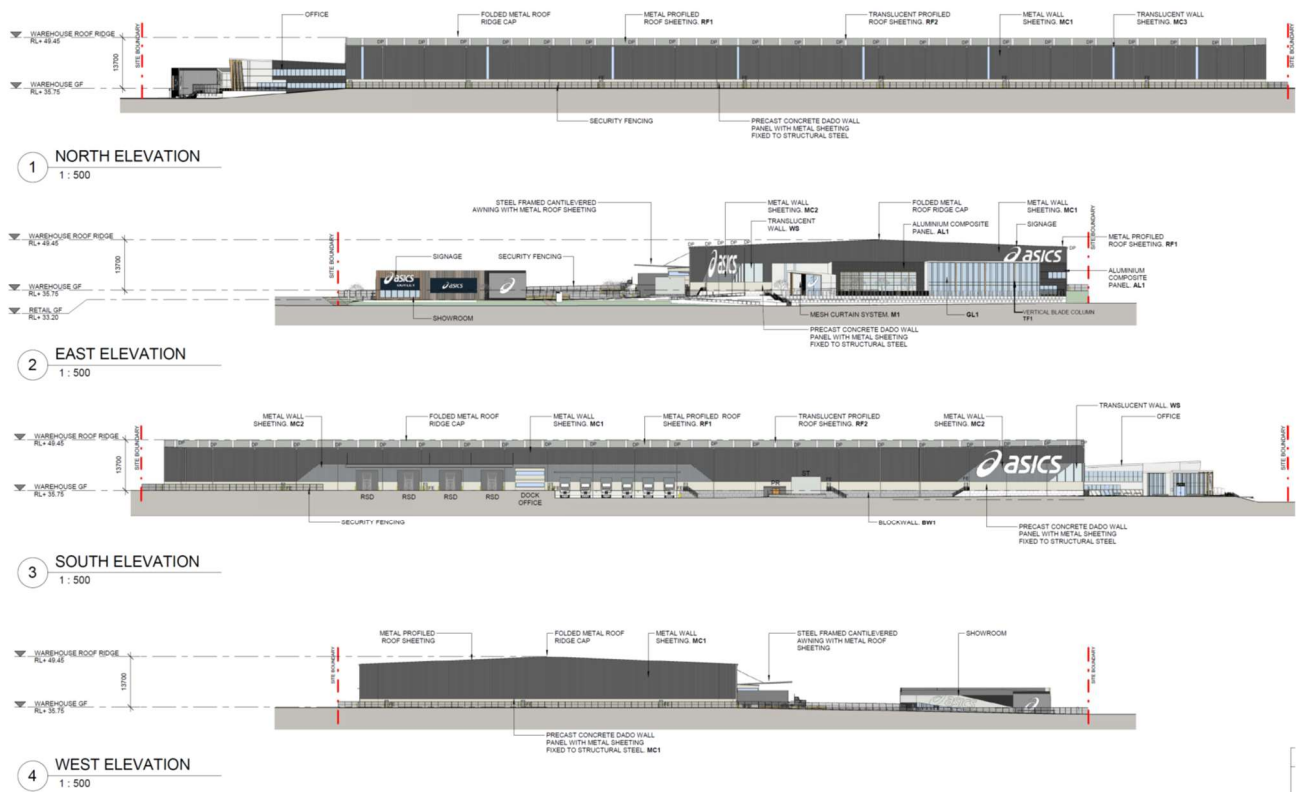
Representative Elevations – Warehouse (Source: Reid Campbell)
